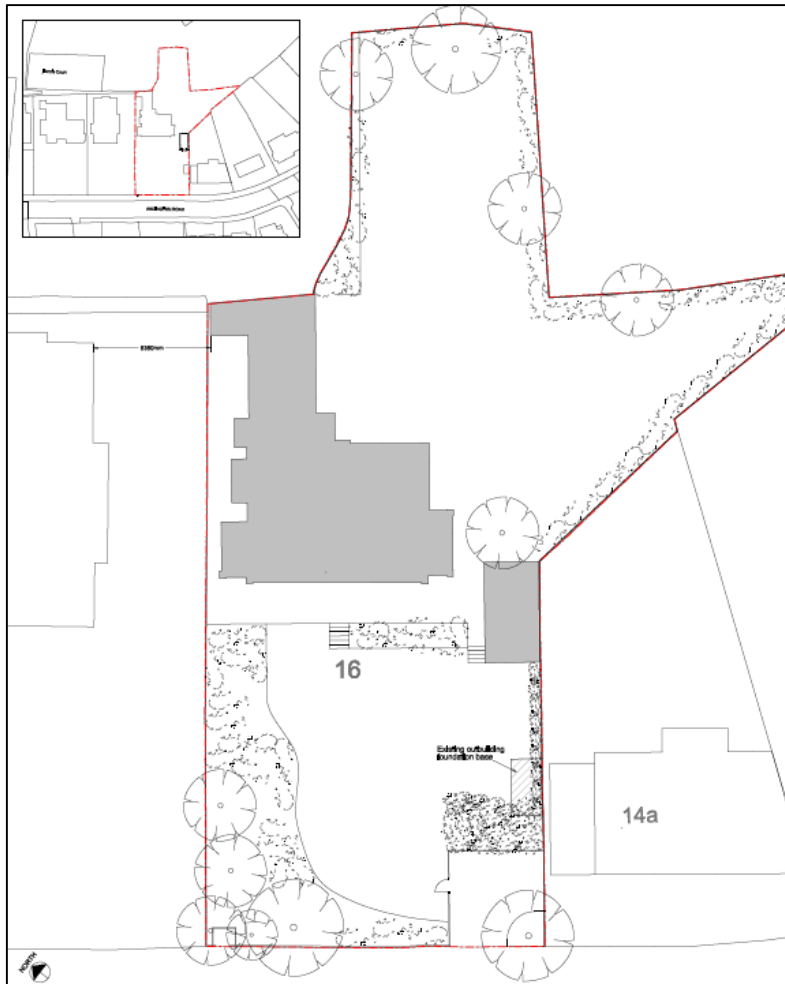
Proposed New Garage, Garden Store and Bike Shed
